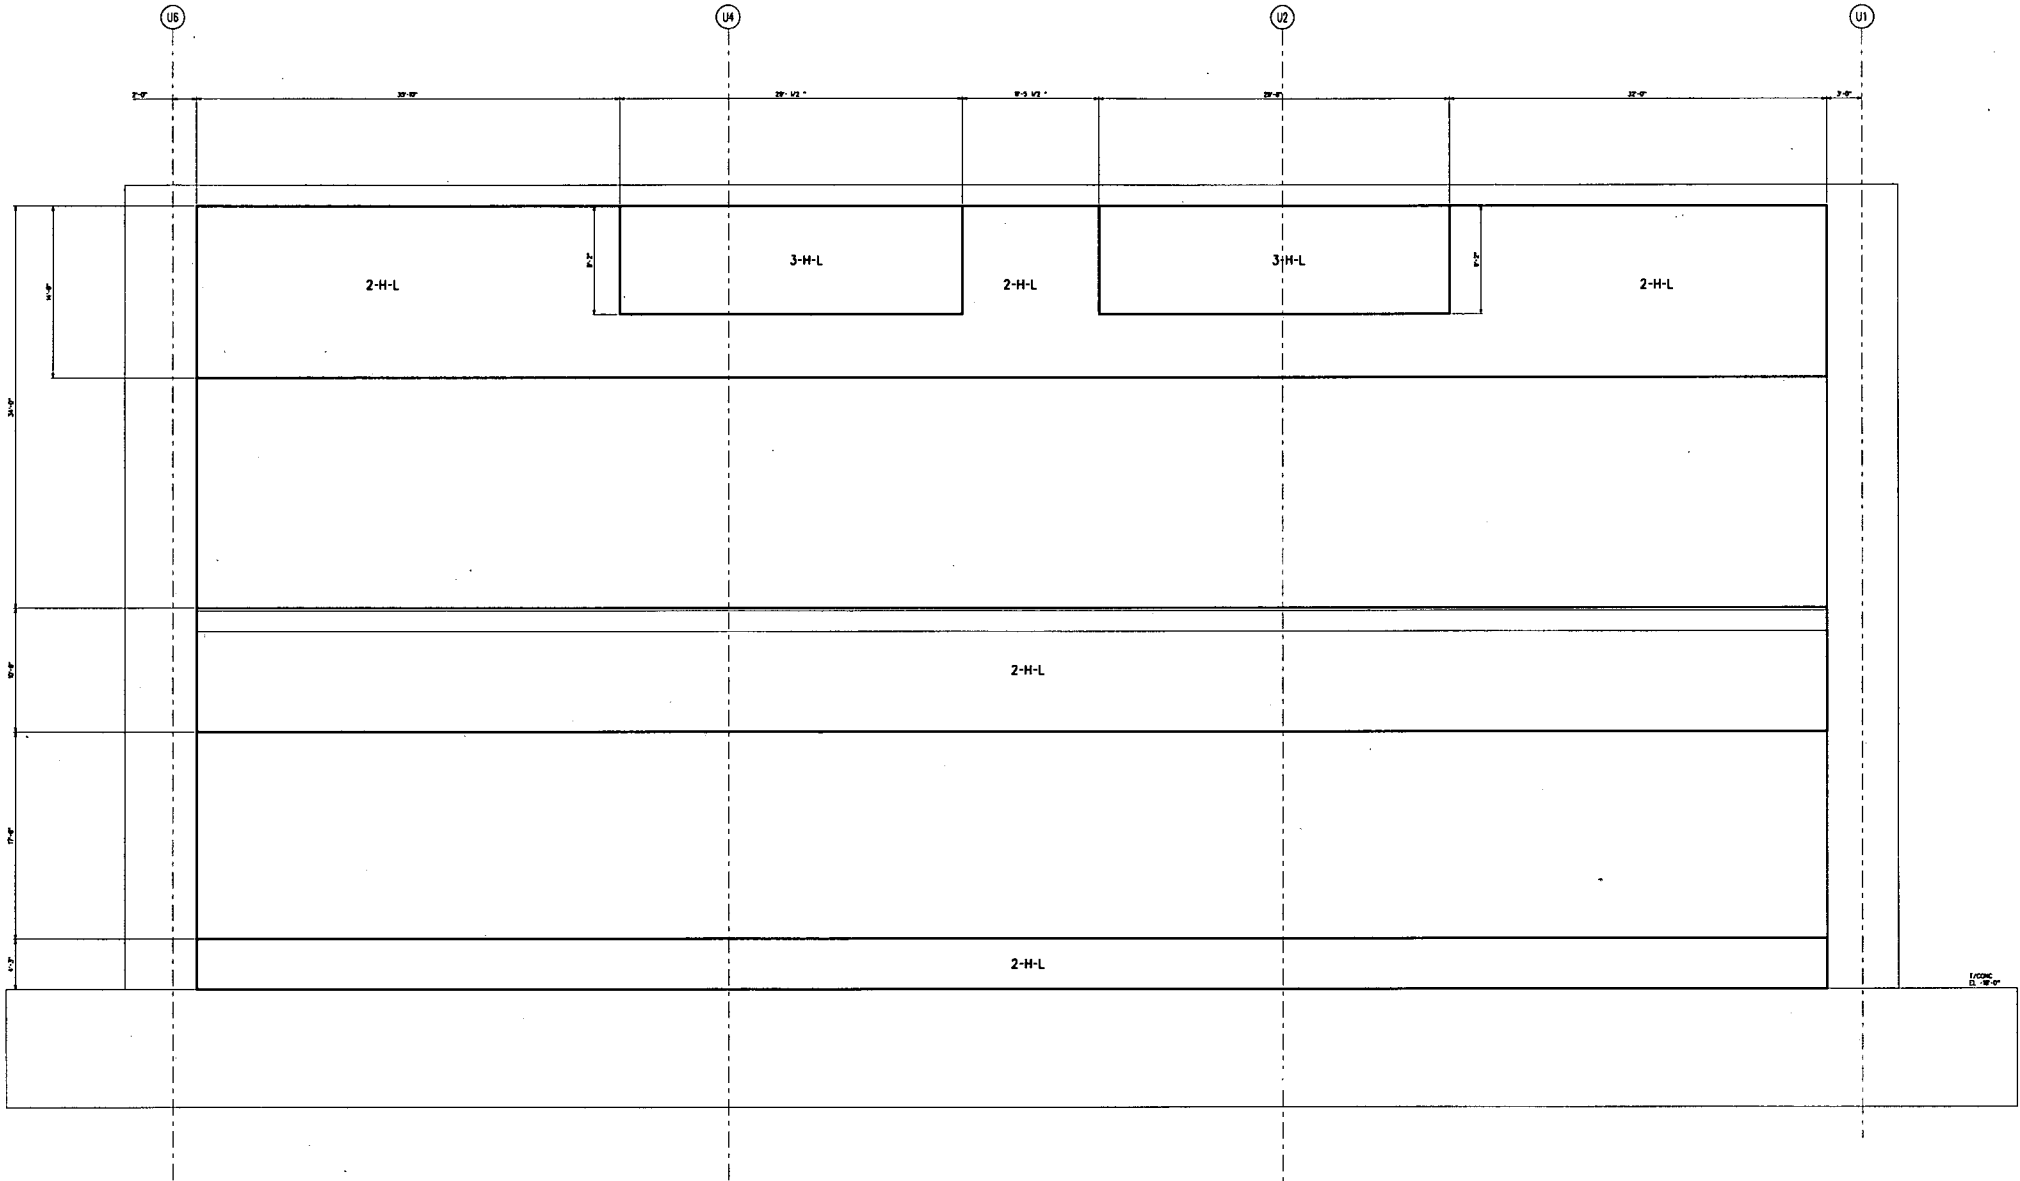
H.6-52: PUMPHOUSE NORTH WALL LOOKING SOUTH
